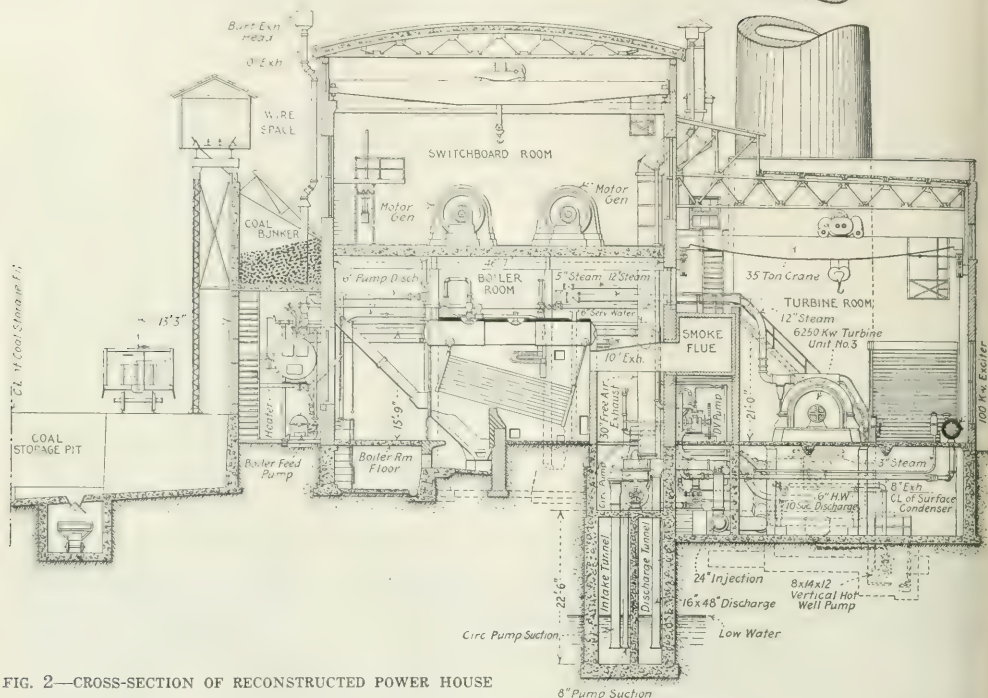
CROSS-SECTION OF RECONSTRUCTED POWER HOUSE
